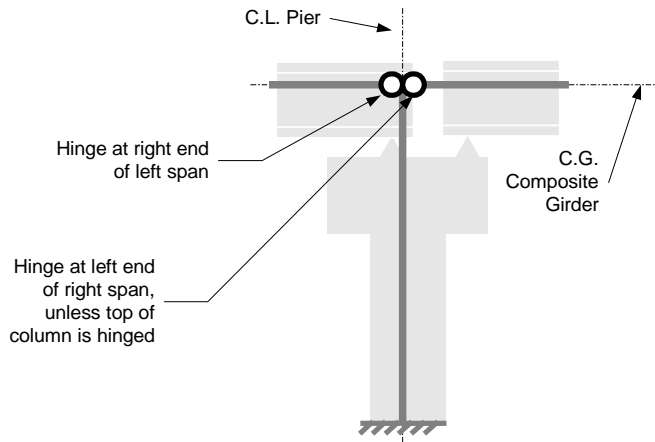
Simple Support Pier Connection on a Fixed Height Idealized Pier
